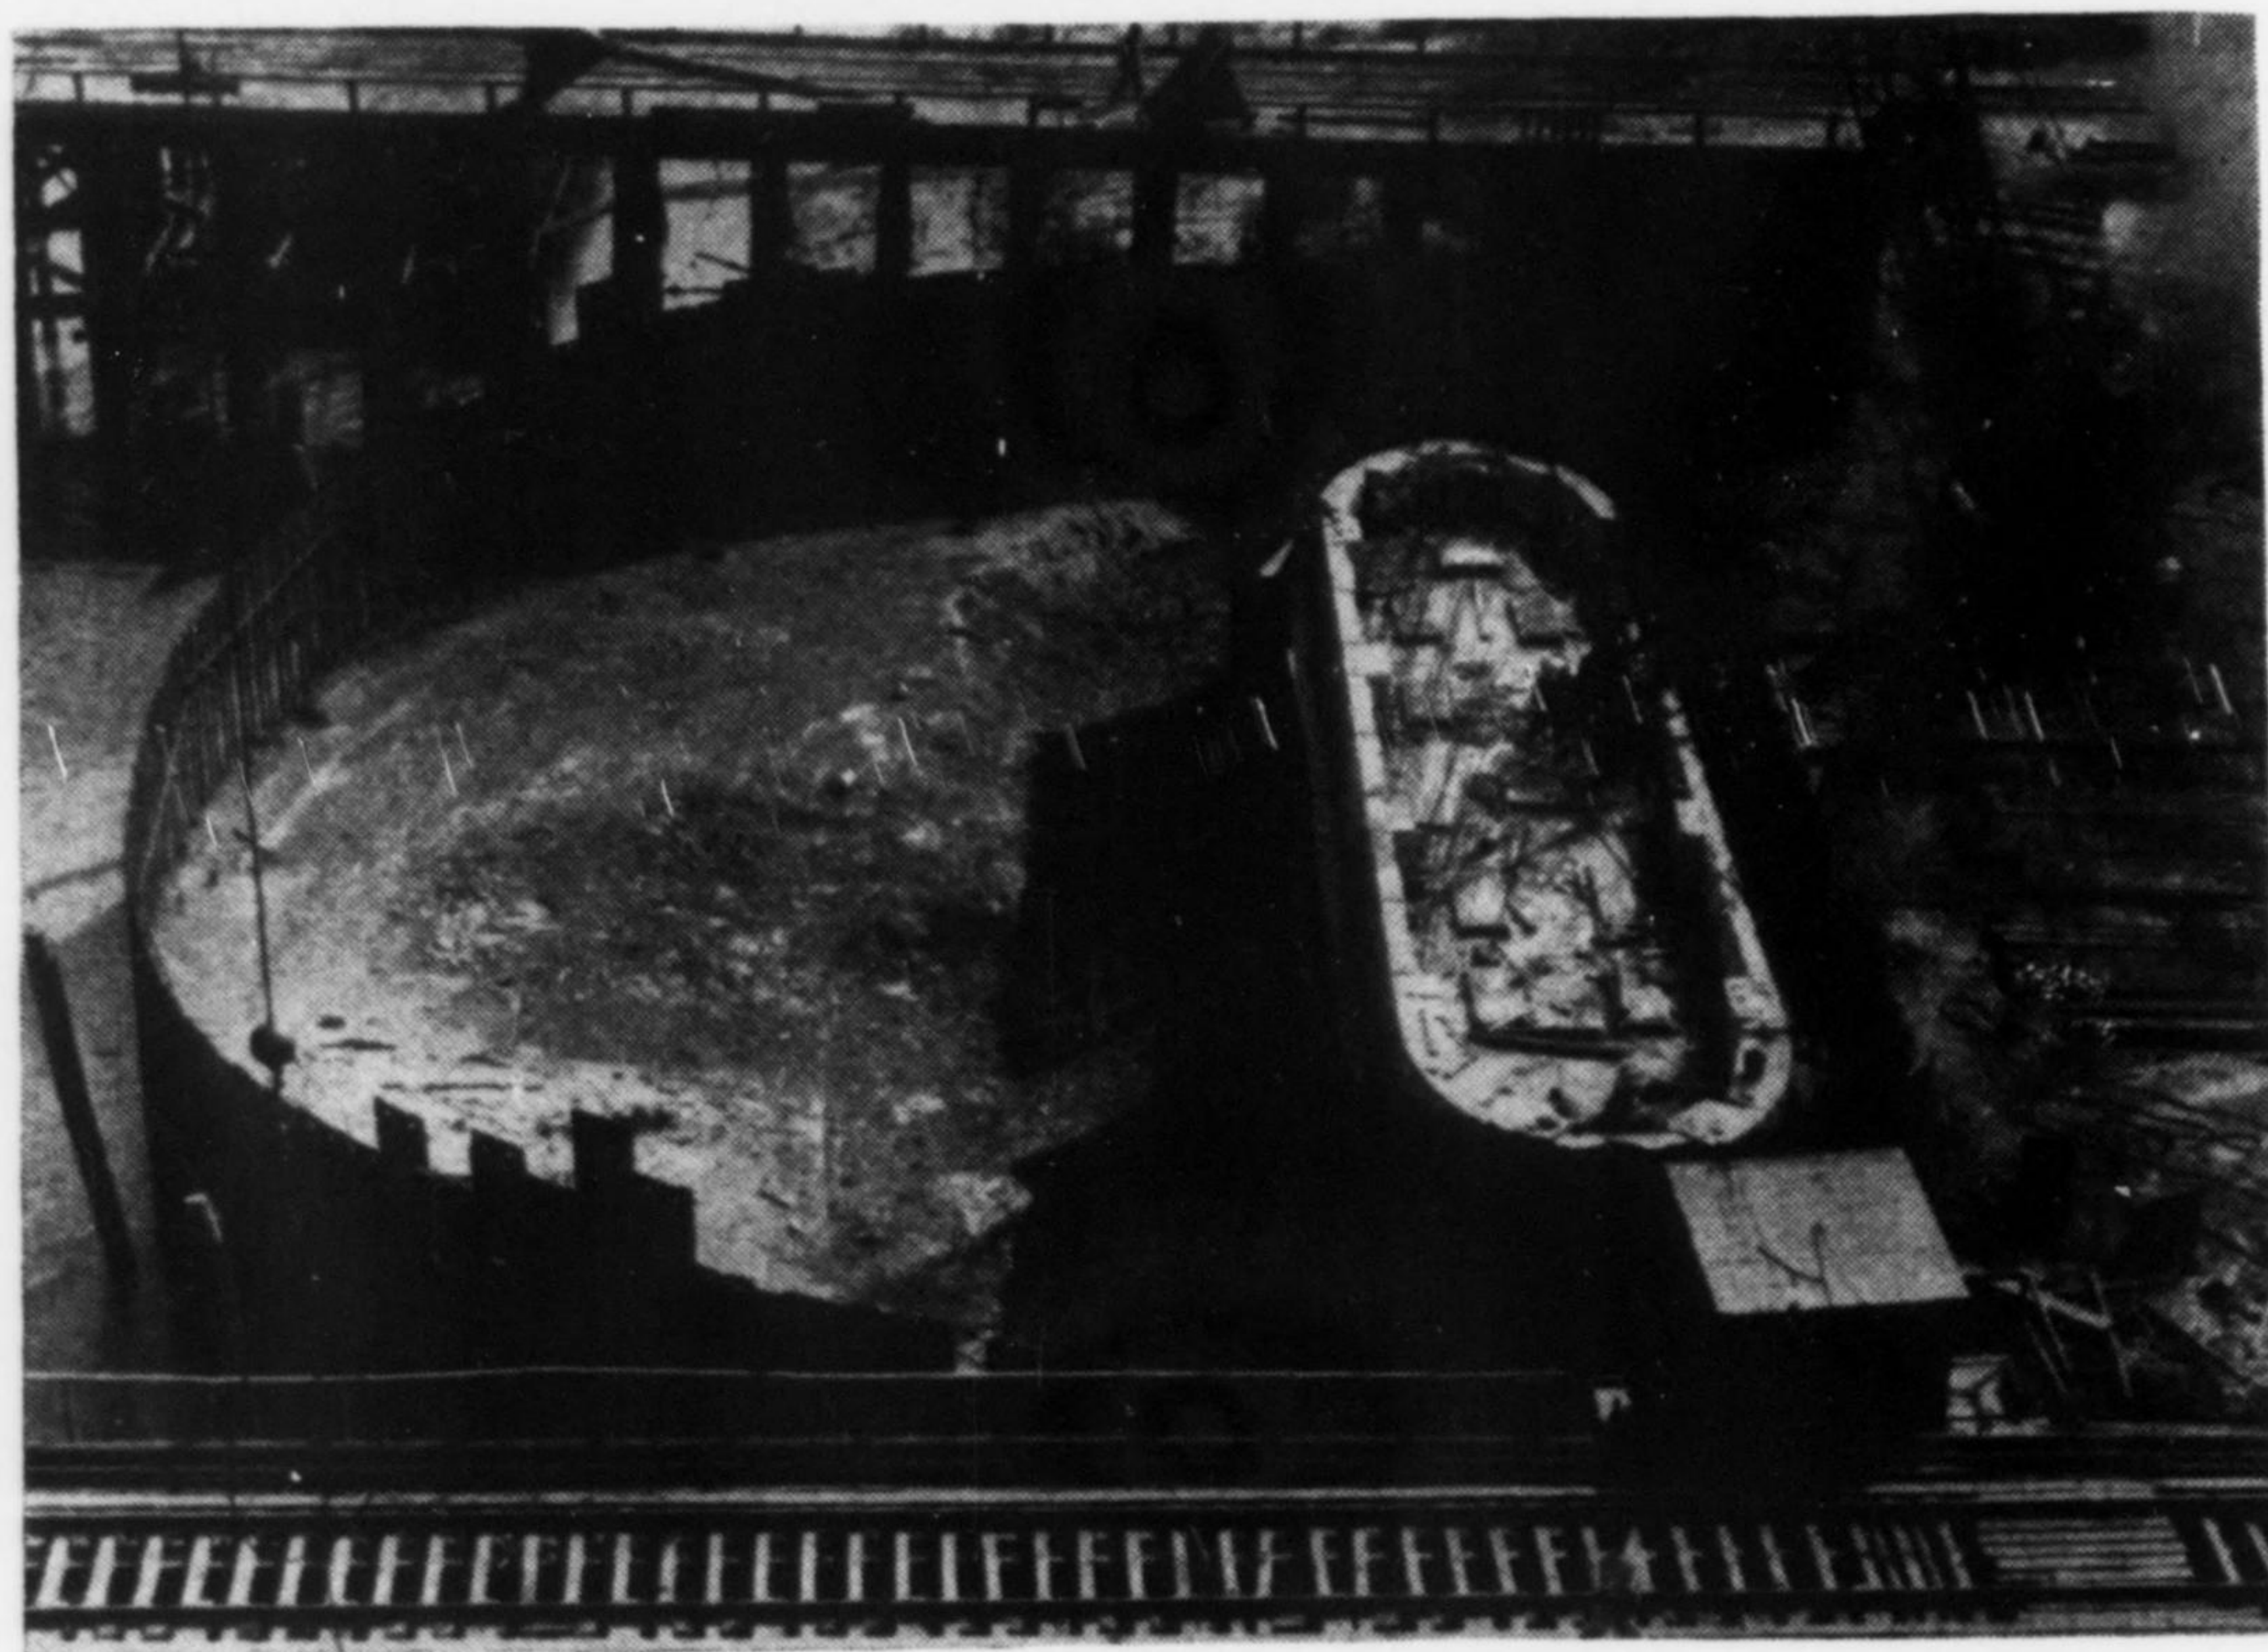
A single wall of sheetpiles set on top of the caisson sections of all piers except II and III served as a cofferdam to permit masonry work down to the caisson top. Sheetpiles were pulled after pier was complete to above their tops.
